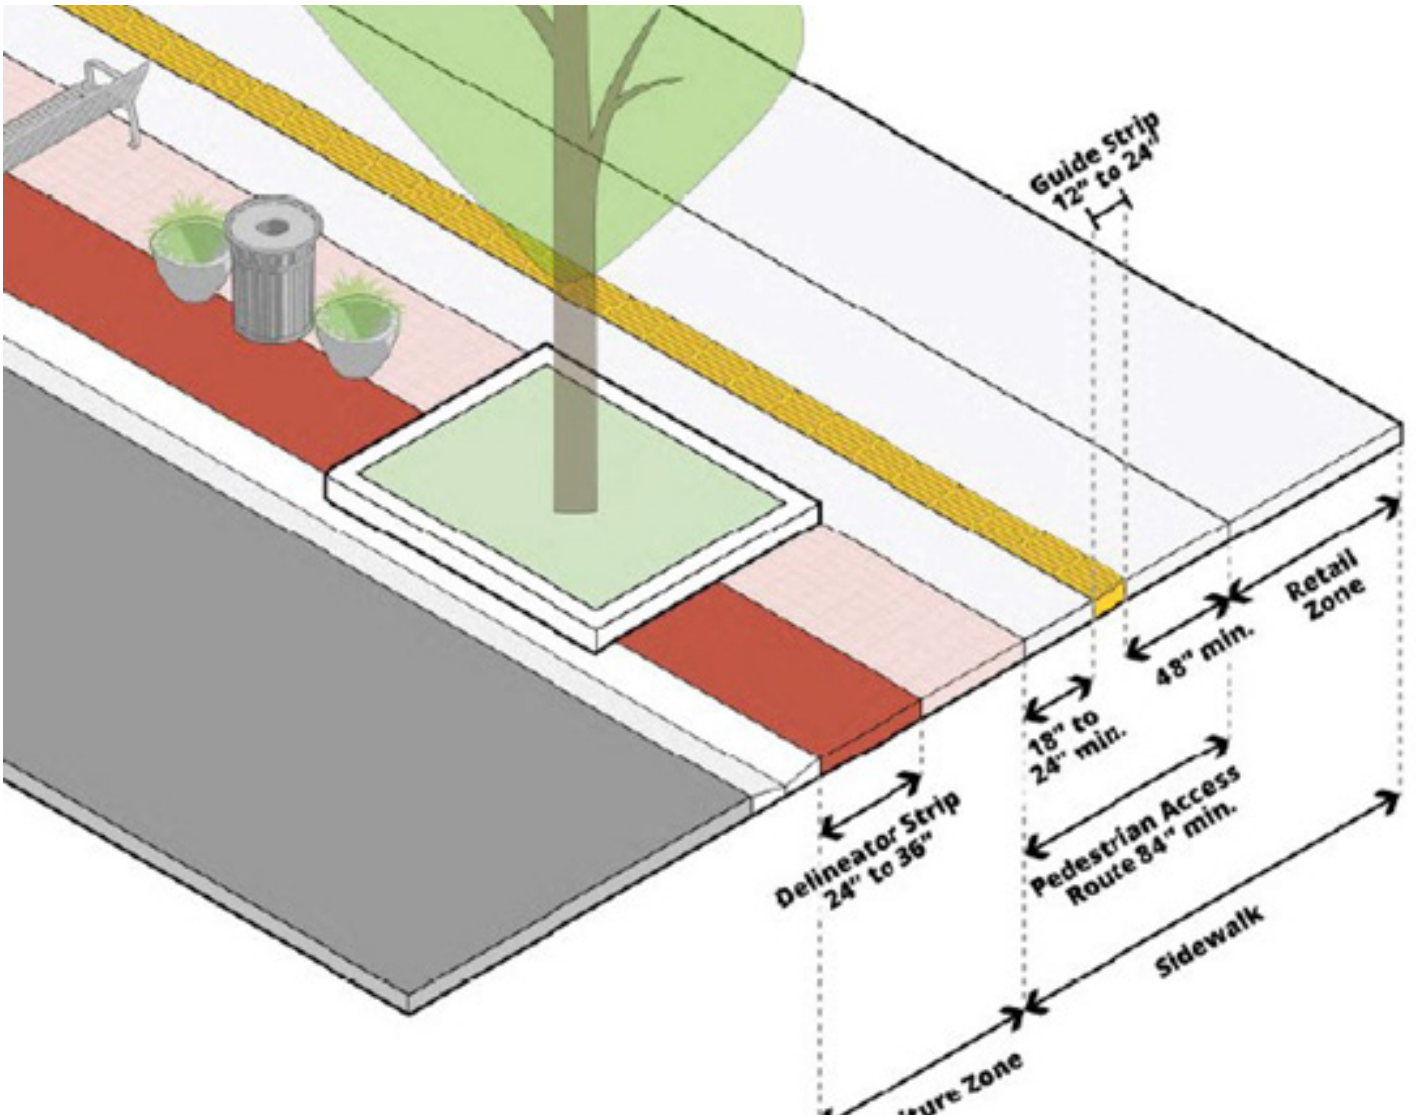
Typical Layout of Guide Strips and Delineator Strips on the Edge of a Flush Street.
